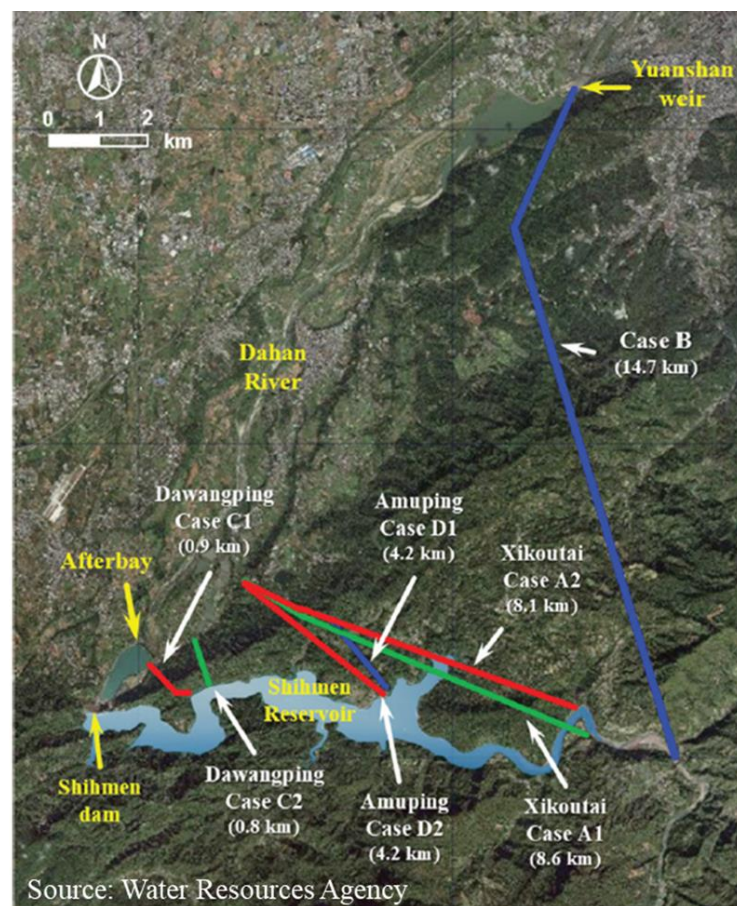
Sediment bypass tunnel planning alternatives in Shihmen Reservoir.
